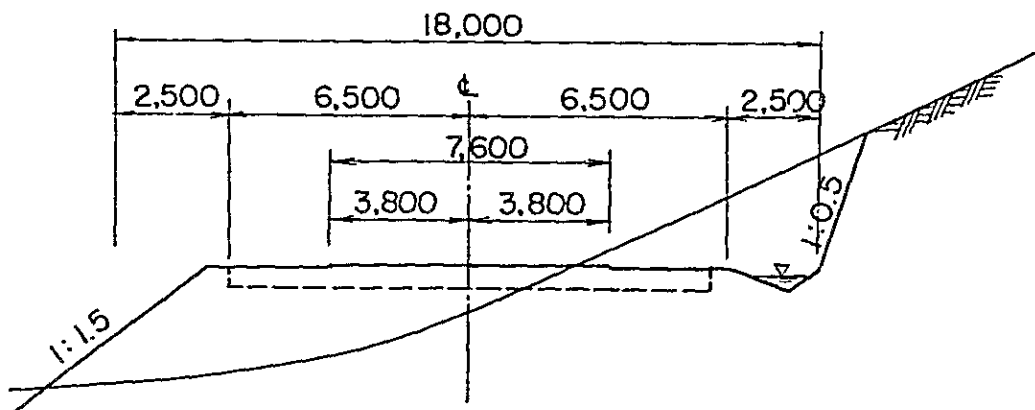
STANDARD CROSS SECTION OF APPROACH FEEDER ROAD
